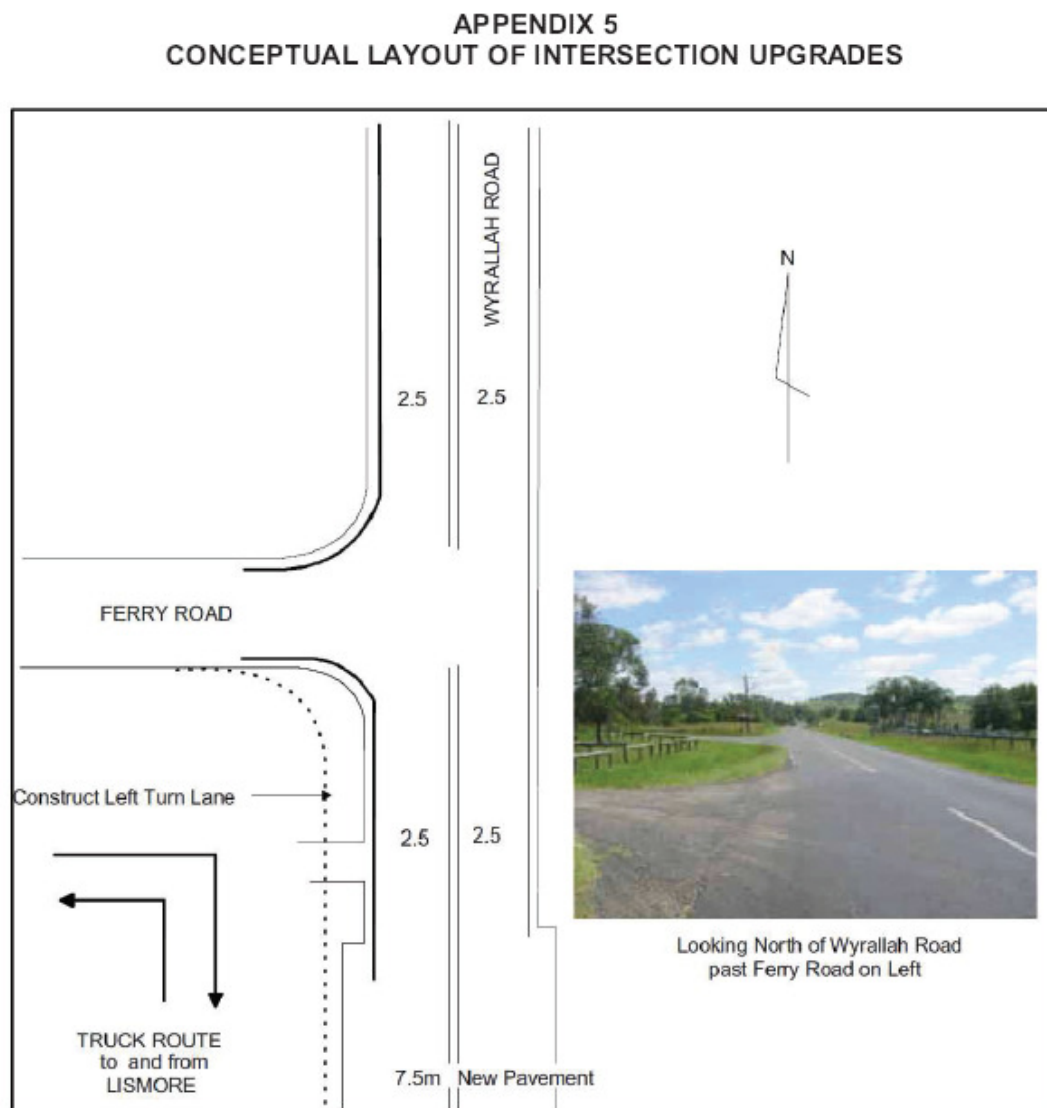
Wyrallah Road / Wyrallah Ferry Road Intersection Upgrade
